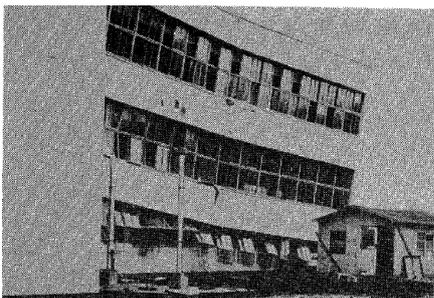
Damaged building of Misawa Commercial High School²⁾
